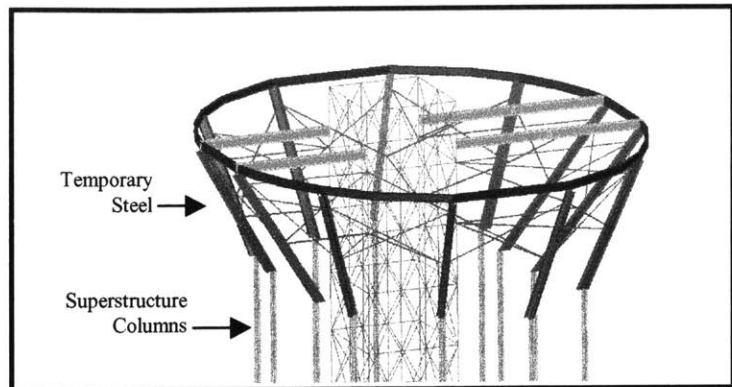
Temporary steel orientation with main floor beams and outer ring beam for construction sequence 1
